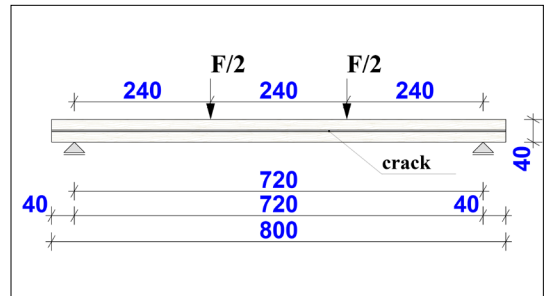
Static model used for testing wooden specimens cracked on one side.
